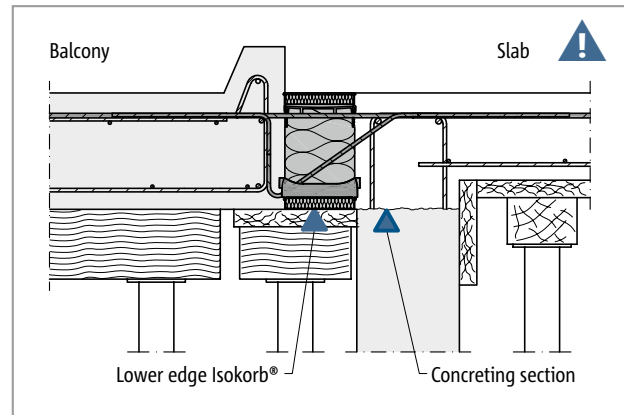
Schöck Isokorb® XT type K: Fully finished balcony with height offset floor on precast reinforced concrete wall
